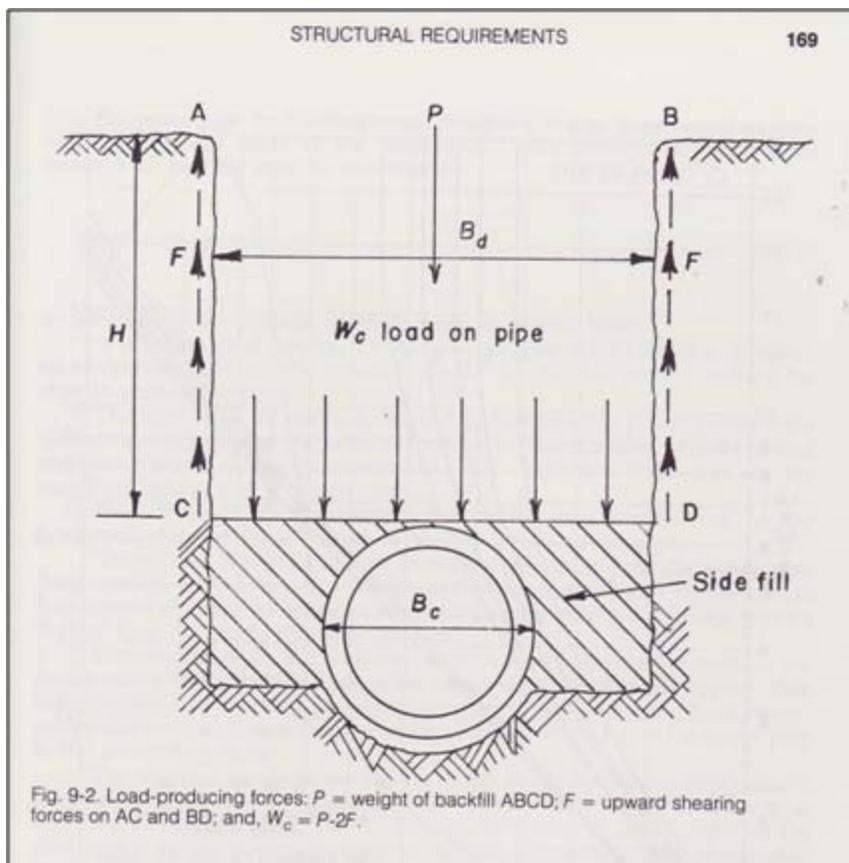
Loads in liner thickness design for centrifugally cast concrete pipe process (Henning, 2010).
